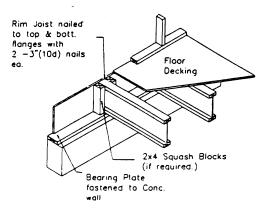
Wood I-beam Floor System (Source: Jager Inc., 1997)
